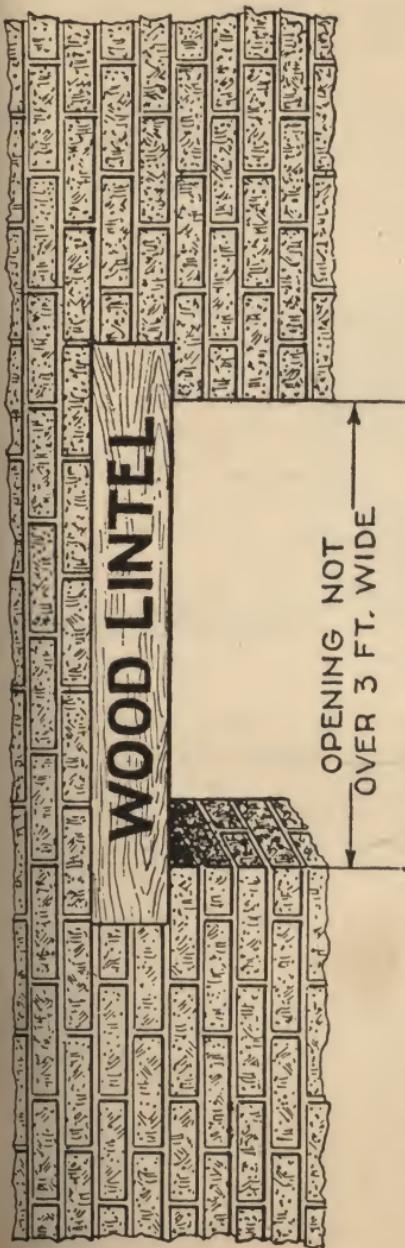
,279.—Wood lintel supporting brick over opening. Wood lintels should not be used to support brickwork on openings over 3 ft. because in case of fire the lintel will be consumed, or depreciate by decay.
